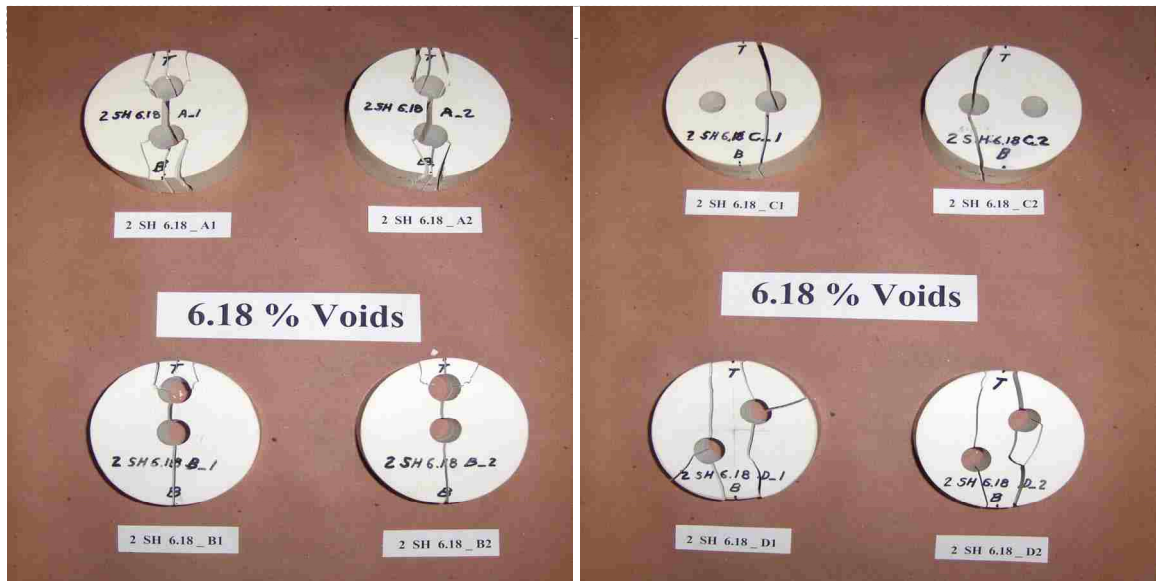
Small Hole 6.18 % Voided Specimens after Testing
